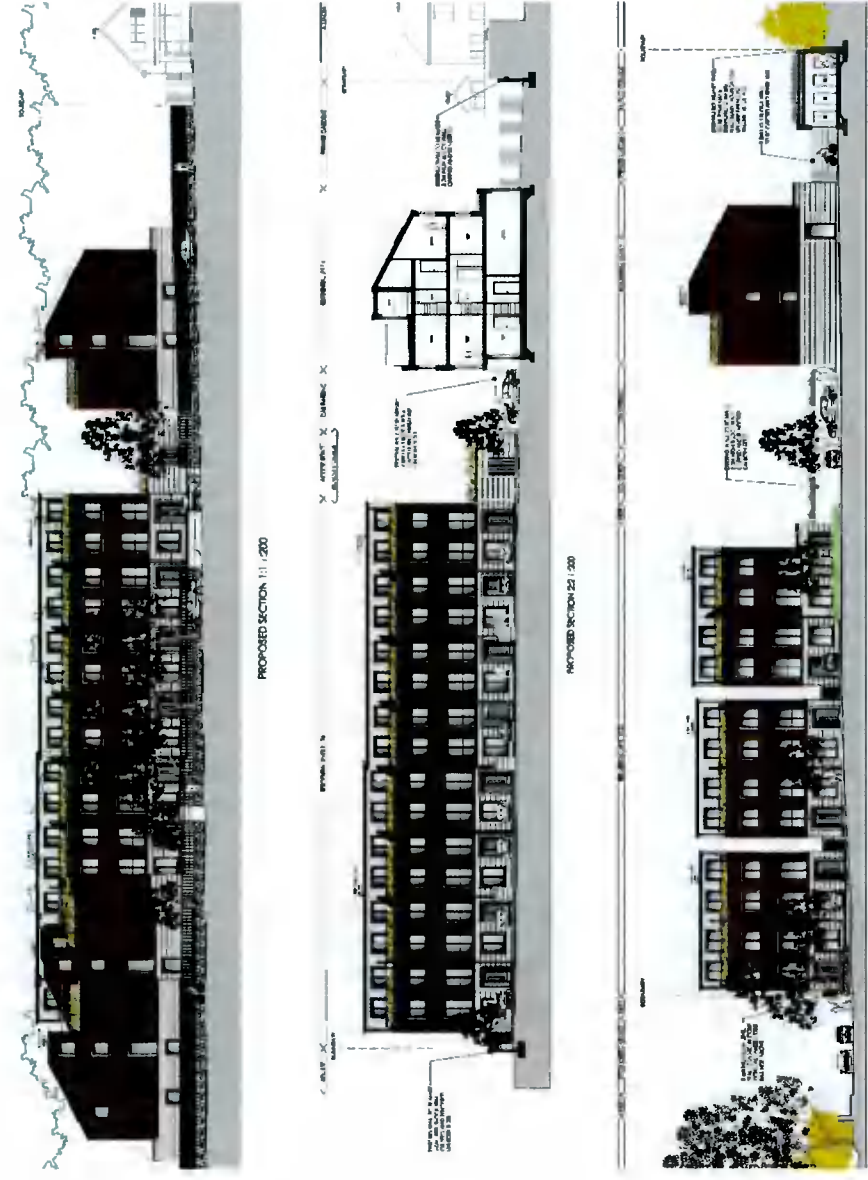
Proposed Site Cross Sections - Produced by bba architecture
